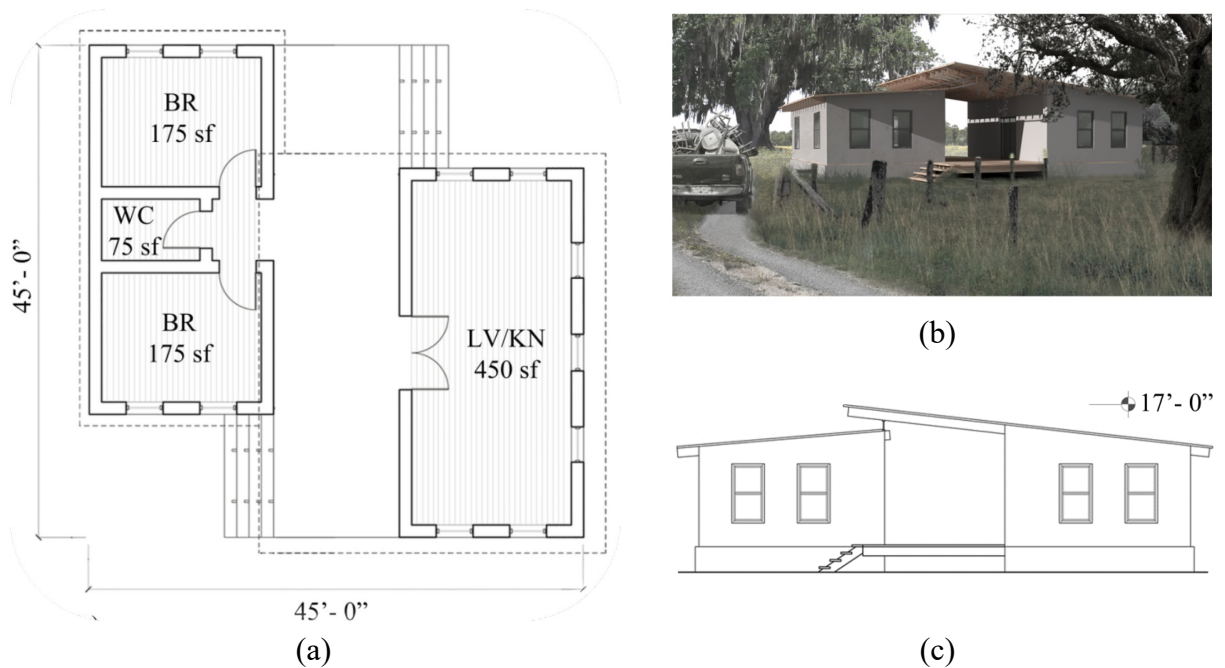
Drawings of the dogtrot prototype house: (a) floor plan, (b) front perspective (rendering), and (c) front elevation (1' = 30.48 cm, 1" = 2.54 cm, and 1 sf = 0.093 m²).
